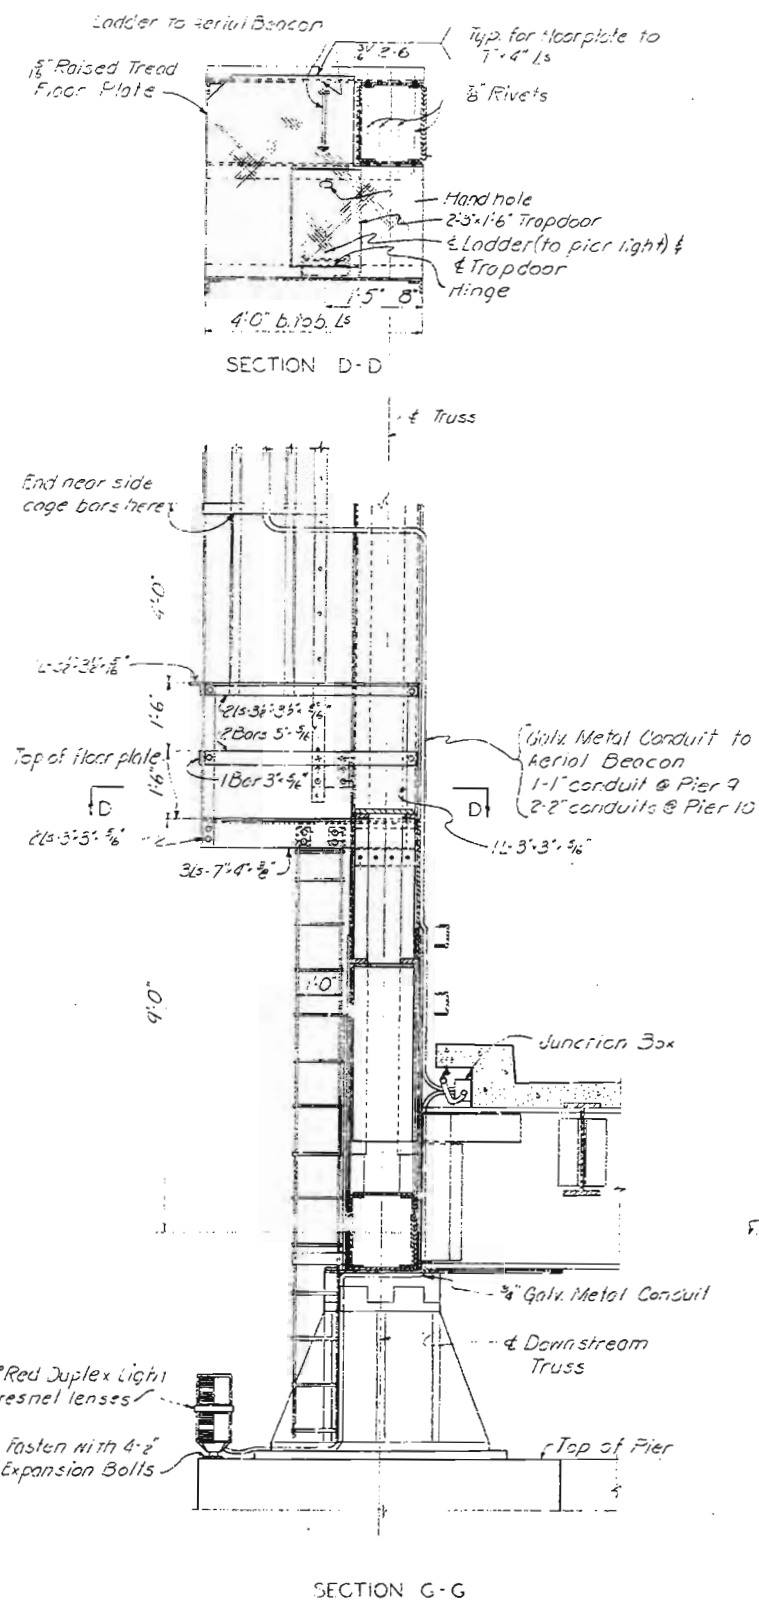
#### DETAIL OF LIGHT AND LADDER AT PIER 8
